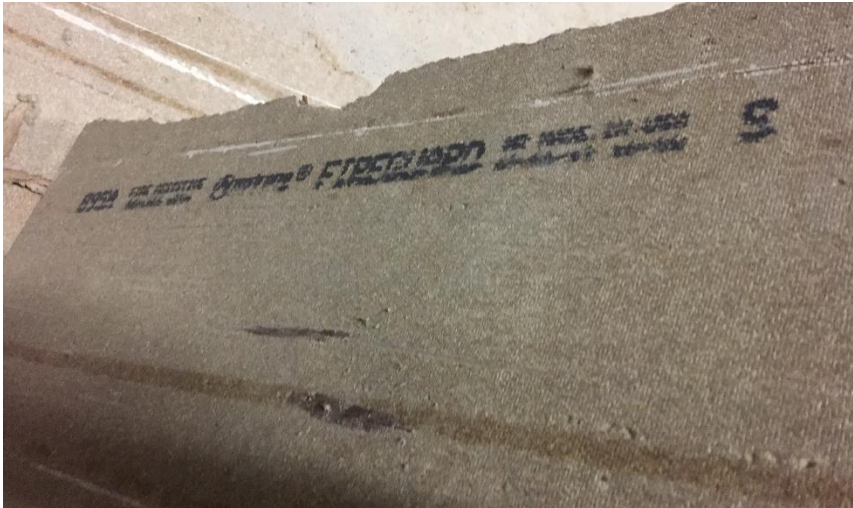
View of the non-asbestos ceiling tiles observed in Room C144 with the date stamp of 2017.
